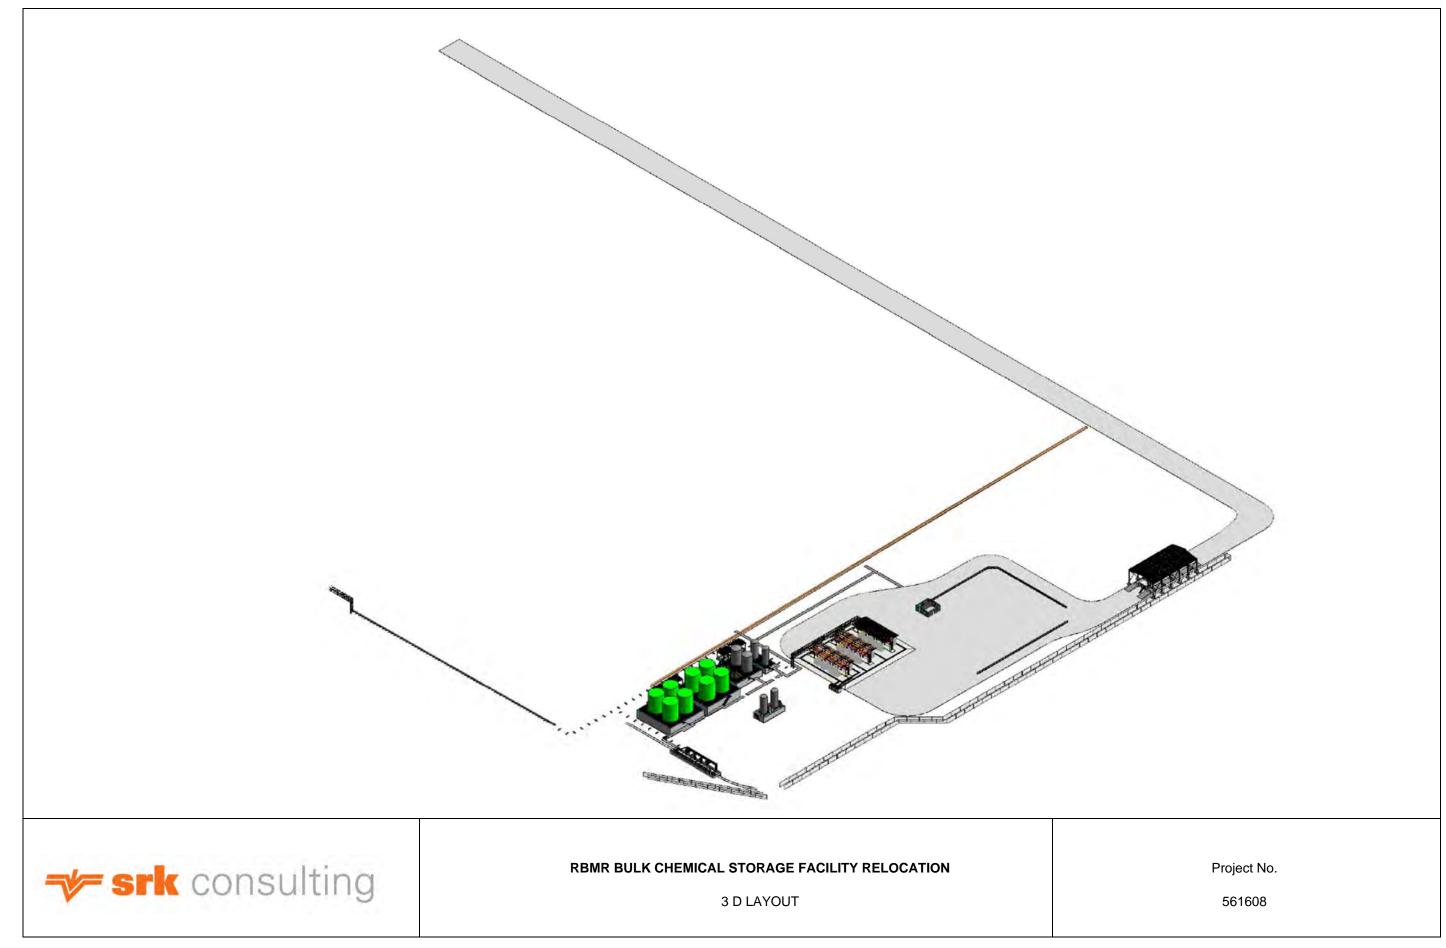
Proposed 3 D Layout Plan of the bulk chemical storage facility
